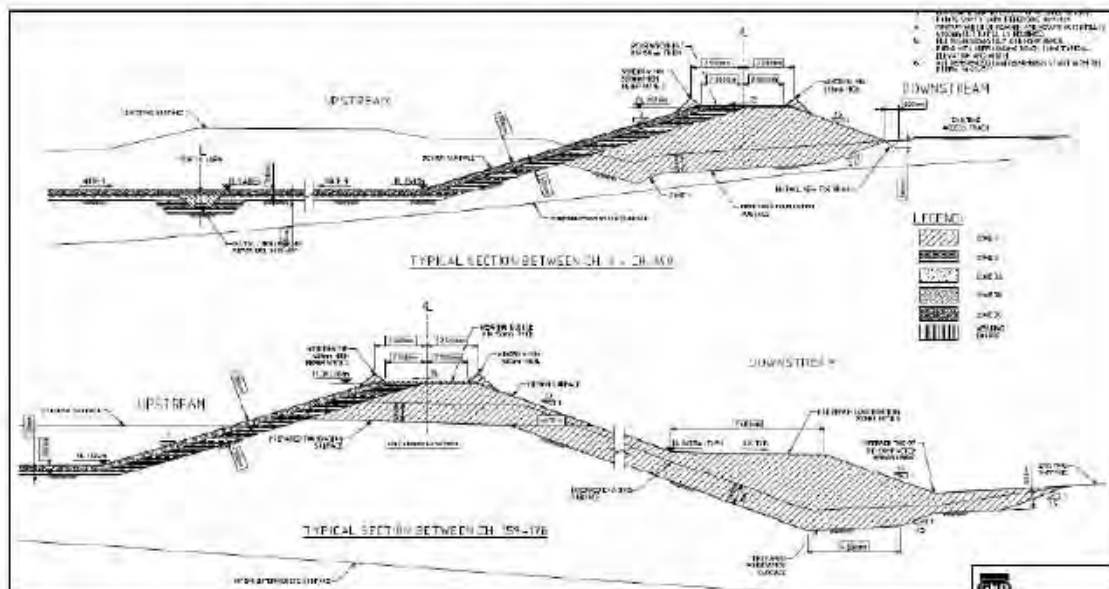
TAD embankment cross section sheet 1 M127/C/18/1 (DM ID: [7454760](#))
